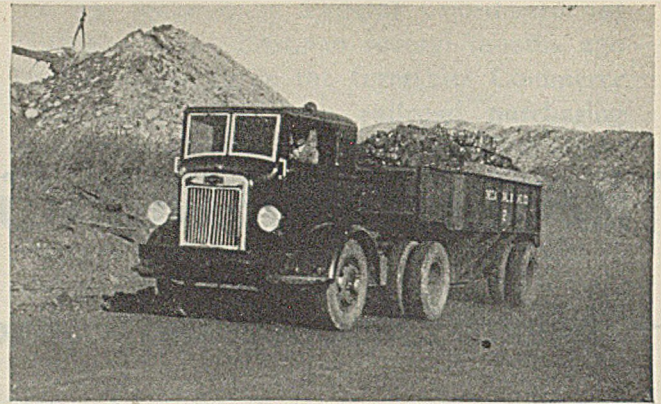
Trailer Haulage at Broken Arrow, Showing Road Construction.
